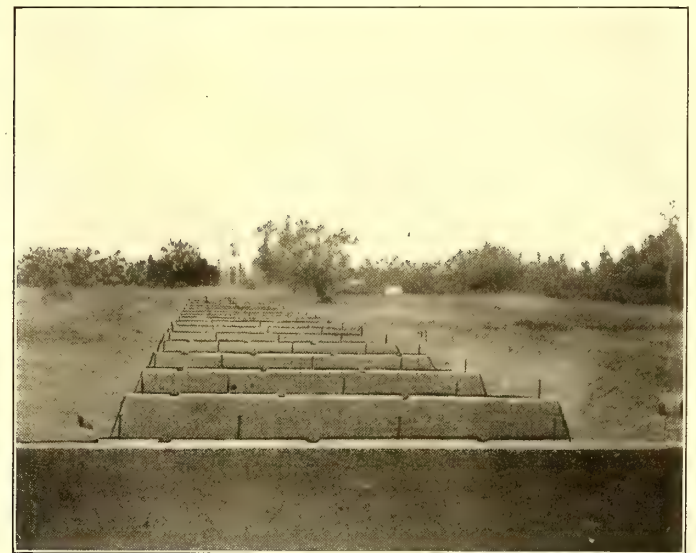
CONCRETE PIER CONSTRUCTION WITHOUT POSTS
